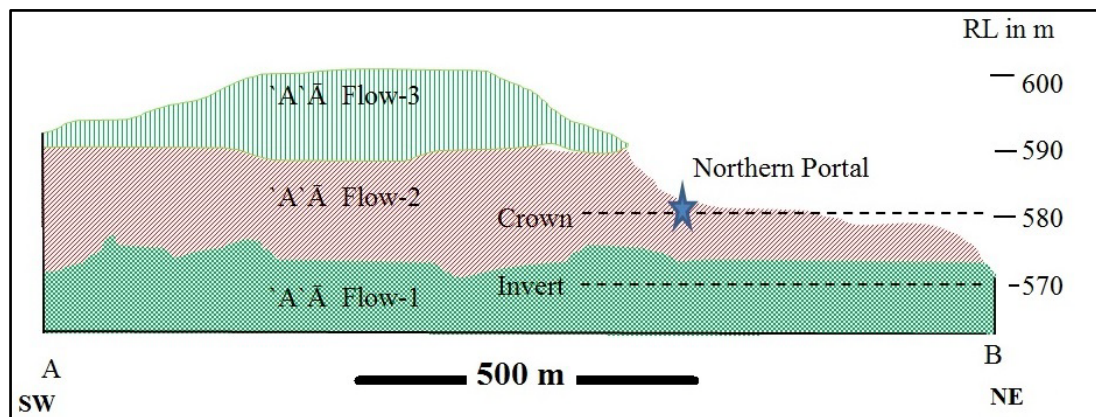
Cross Section along A-B of Gulbarga Tunnel Area
